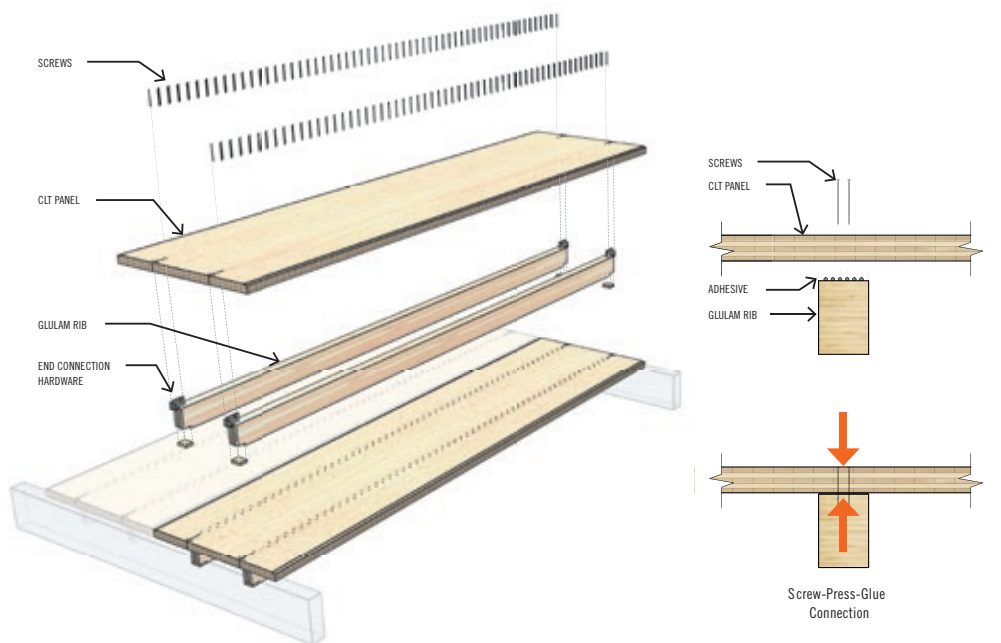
Exploded view of the Kattera Rib Panel components and assembly steps
